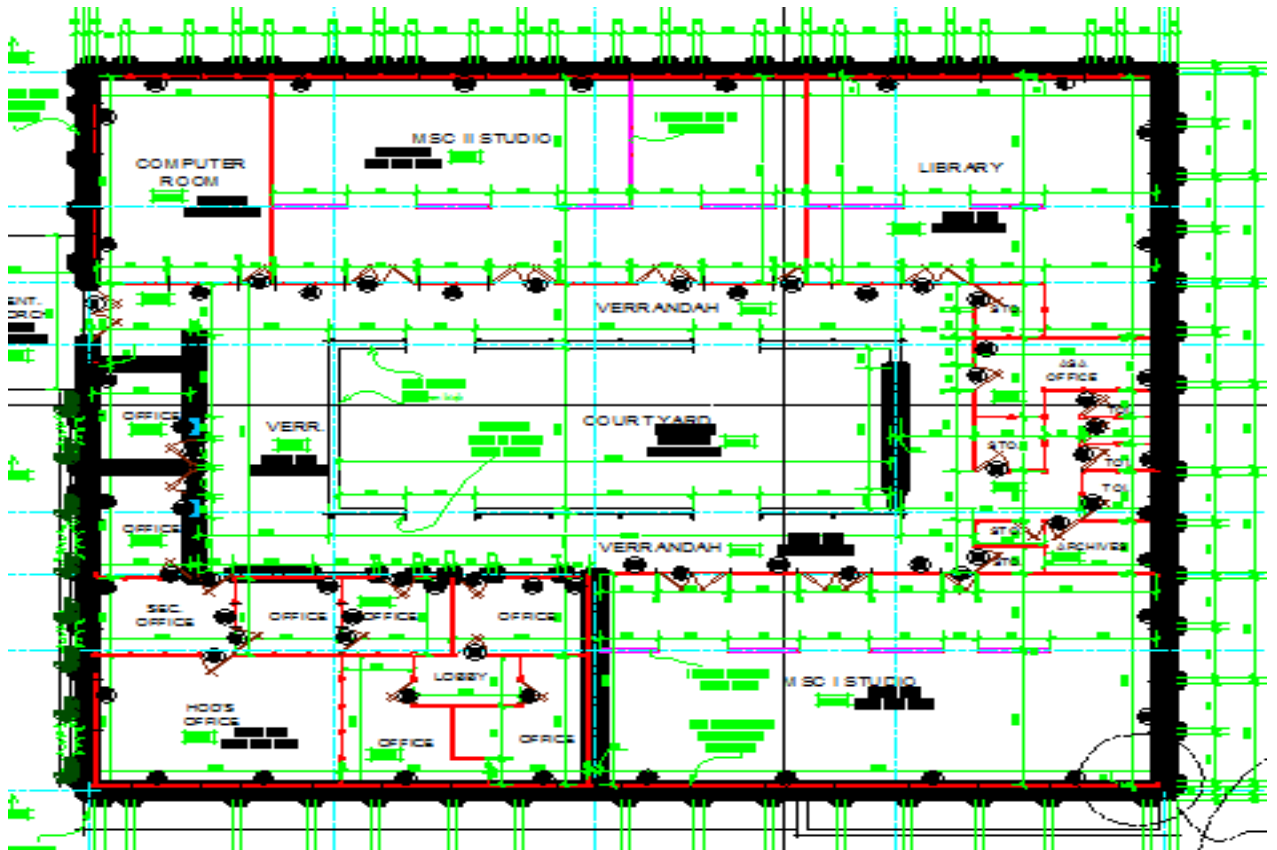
Showing Ground floor plan of M.Sc. Studios and Admin. of department of architecture UNEC.
